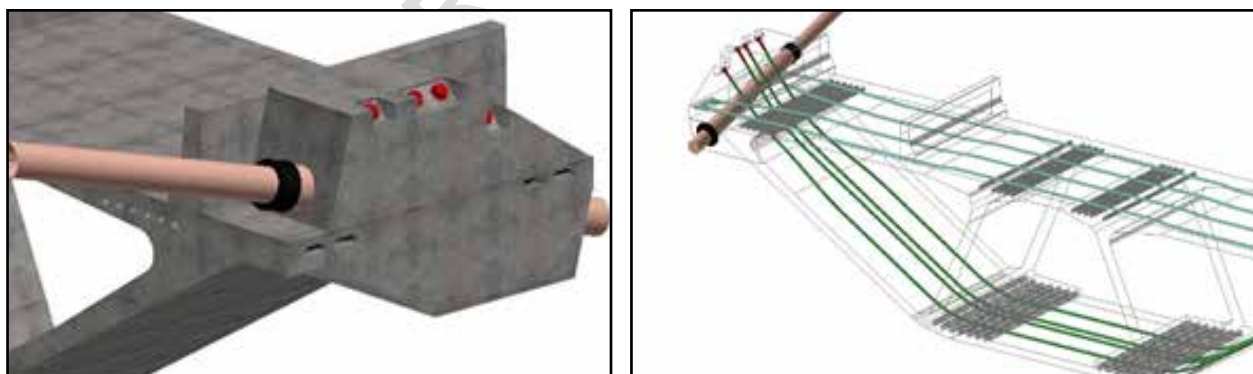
Connection detail of Stay & Superstructure (For laterally supported extradosed Bridge)- Barapullah Extradosed Bridge Over River Yamuna, Delhi
